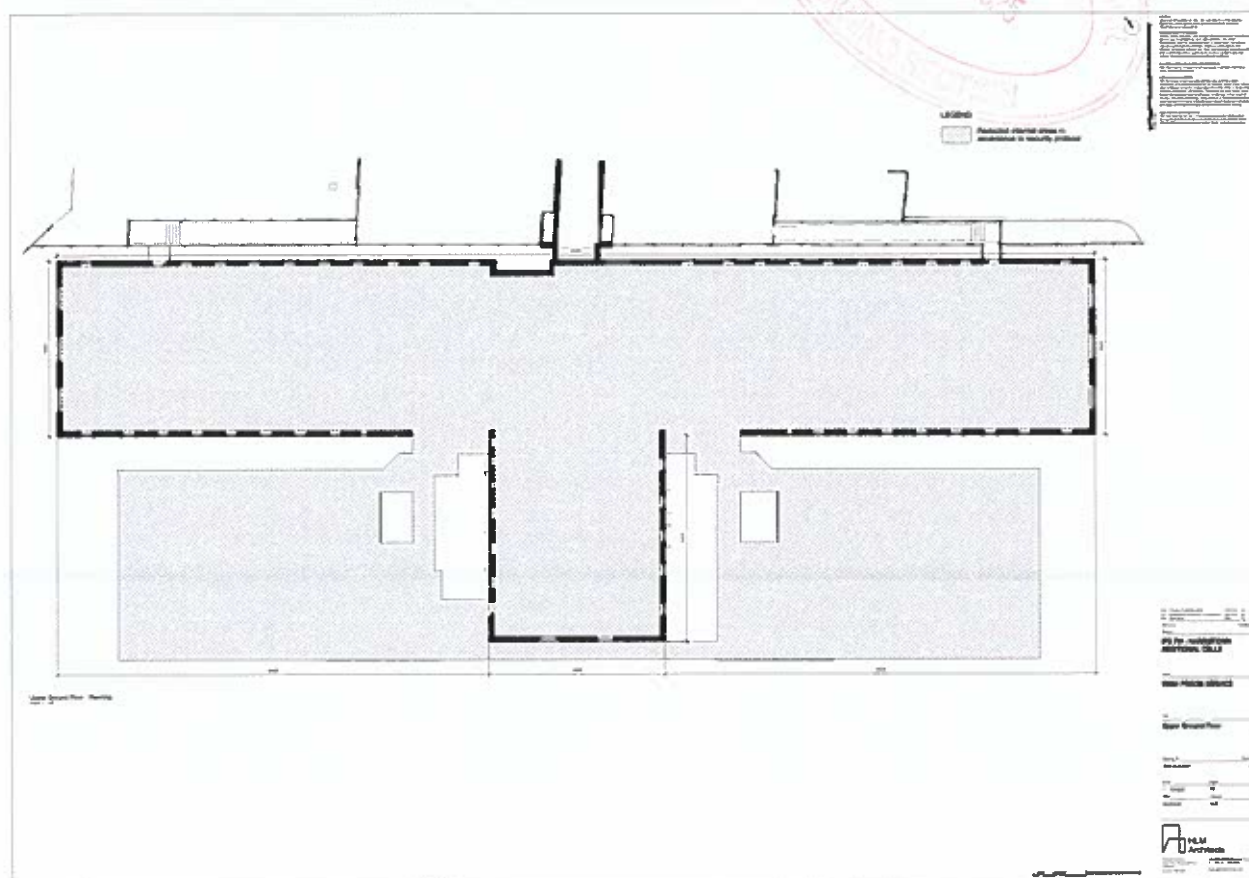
Harristown Block existing floor plan (Source: HLM Architects)
